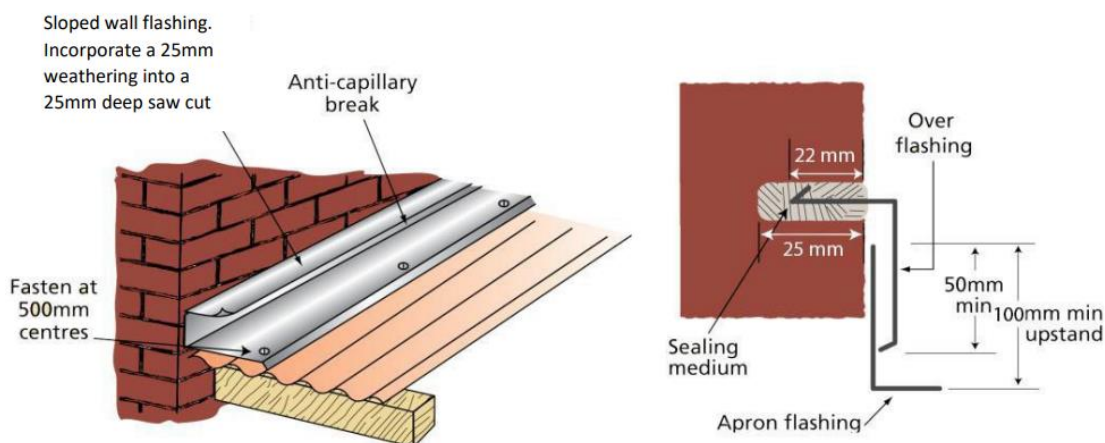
Wall and Step Flashings, referenced from HB 39 Figure 8.4(B)
